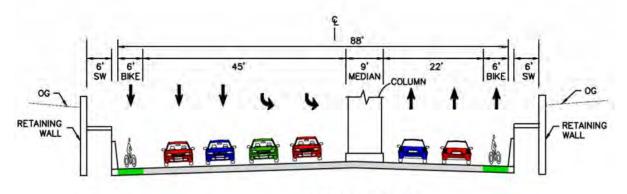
(cont'): Mary Avenue Underpass Tunnel with Jughandle Alternative (Cross-Sections)
